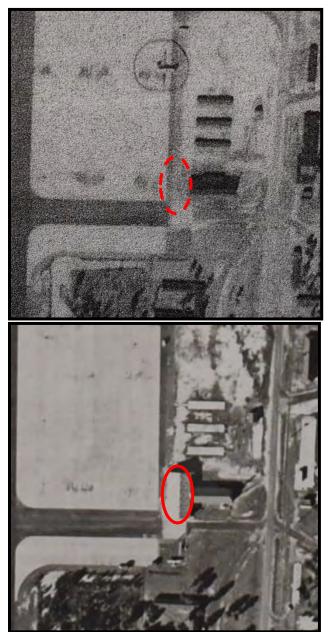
Top, 1952 aerial with future site of Building 1220 circled by broken red line; bottom, Building 1220 in 1956 appended to earlier building at its east elevation (source: Savannah Airport Commission)
